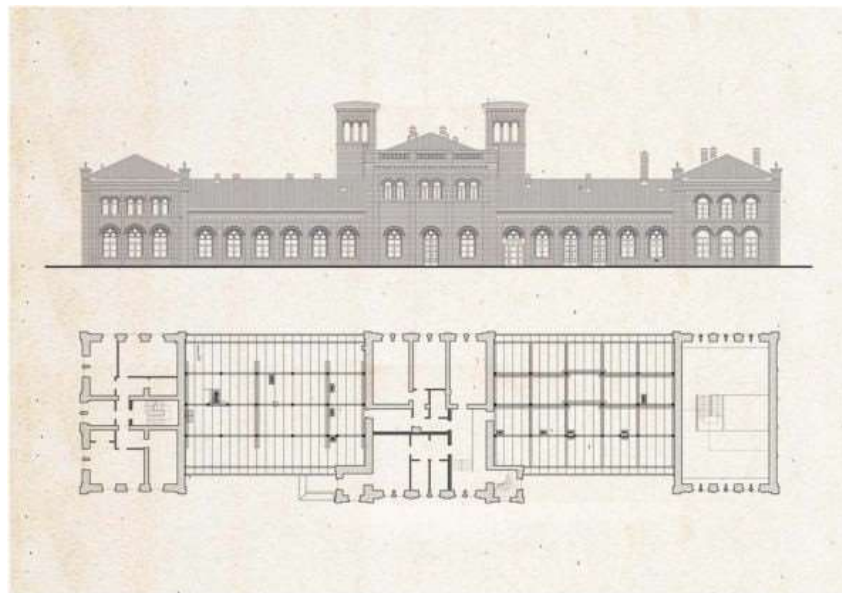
North-east elevation and first floor plan, drawing DOMUS, author, 2011, [9]
